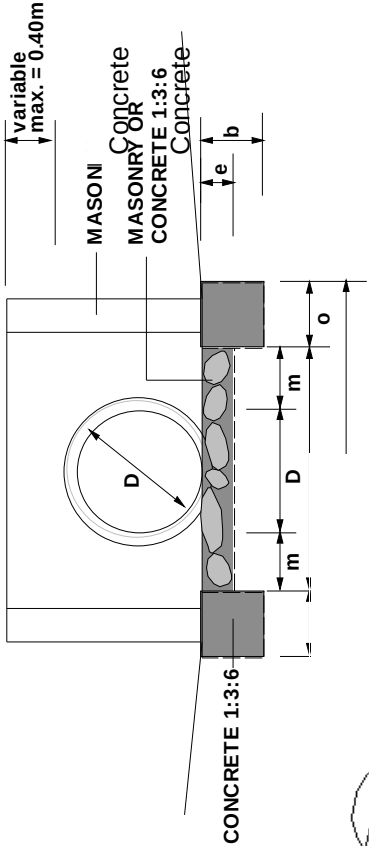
HEADWALL TYPE 3A (CONCRETE BLOCK HEAD WALLS)
